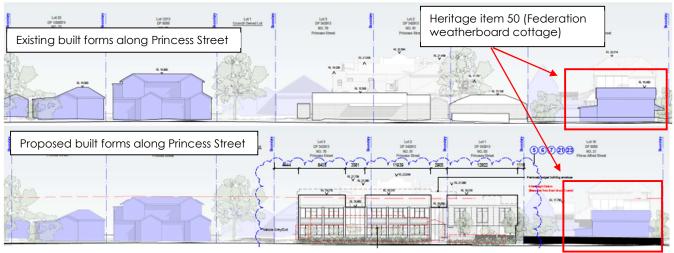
Extract from the Princess Street elevations, with the existing elevations (top) and proposed elevations
